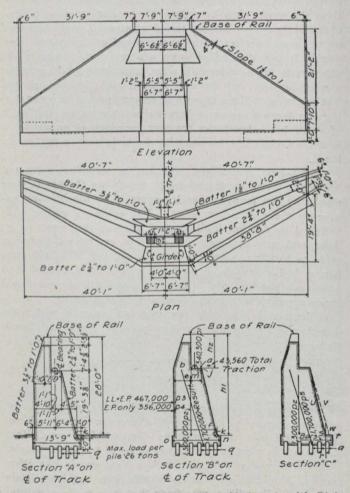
Type B<sub>i</sub>; Plain Concrete Wing Abutment, with Plain Concrete Backwall.
